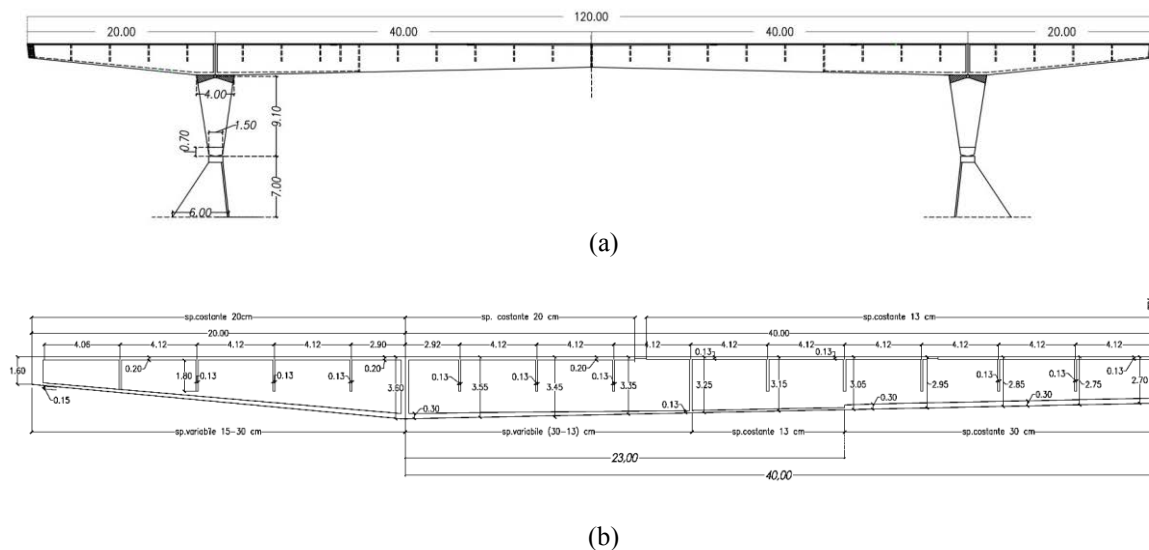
(a) Longitudinal scheme of the bridge and (b) detail of the deck
